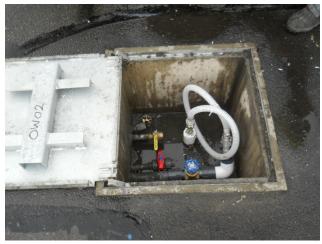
Connections from sub grade to above ground piping for air, water, and sewer.
